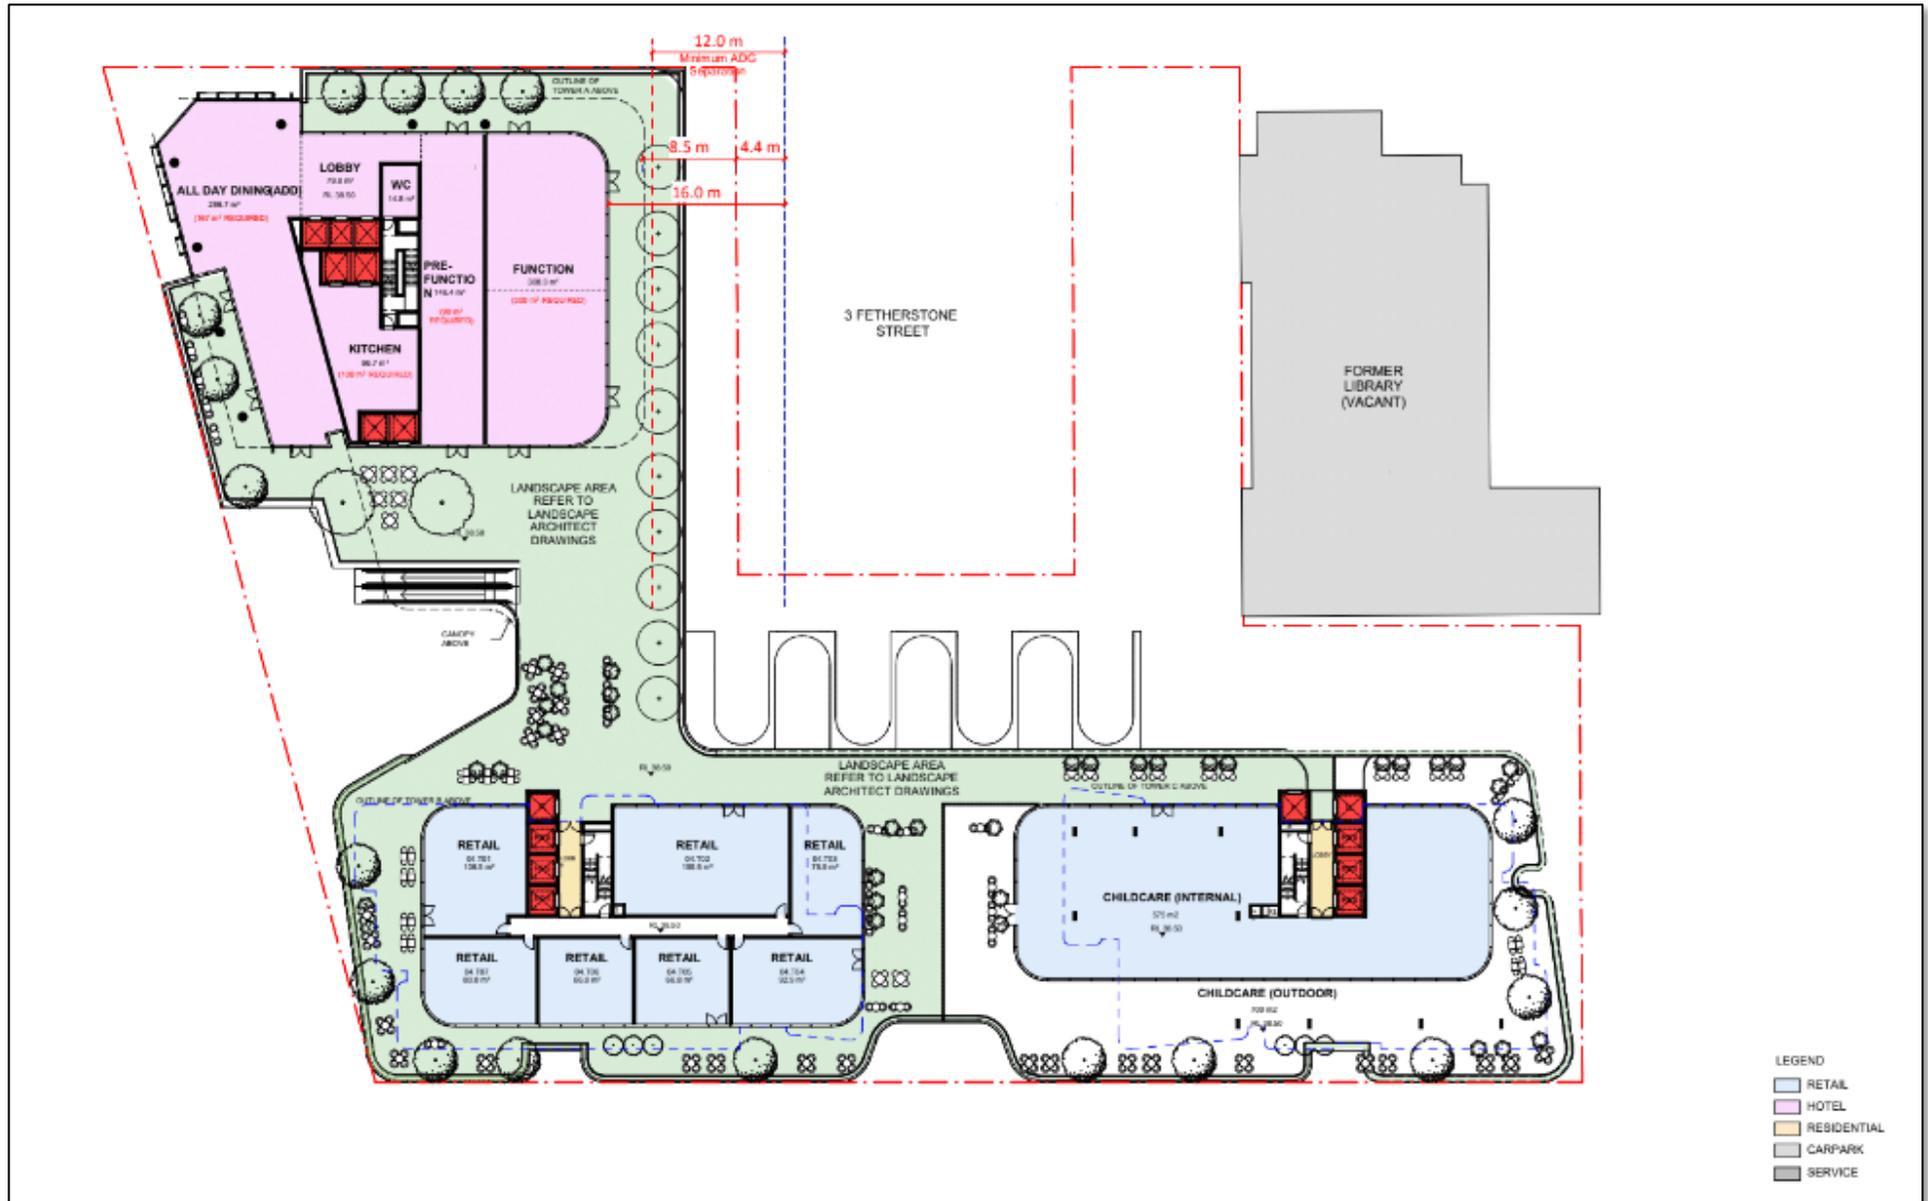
Proposed Level 04 Plan- Please refer to Architectural Plans for greater clarity.
